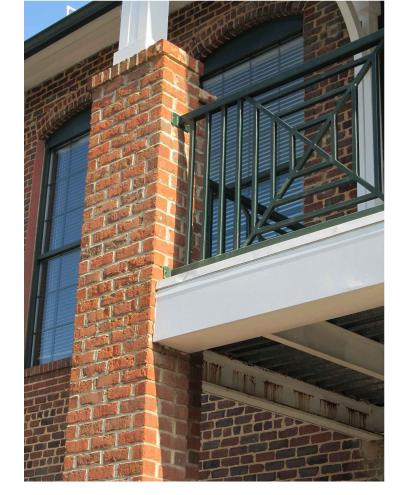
EXISTING BRICK COLUMN INTEGRATED WITH WHITE PLYWOOD AND GREEN-PAINTED METAL.
